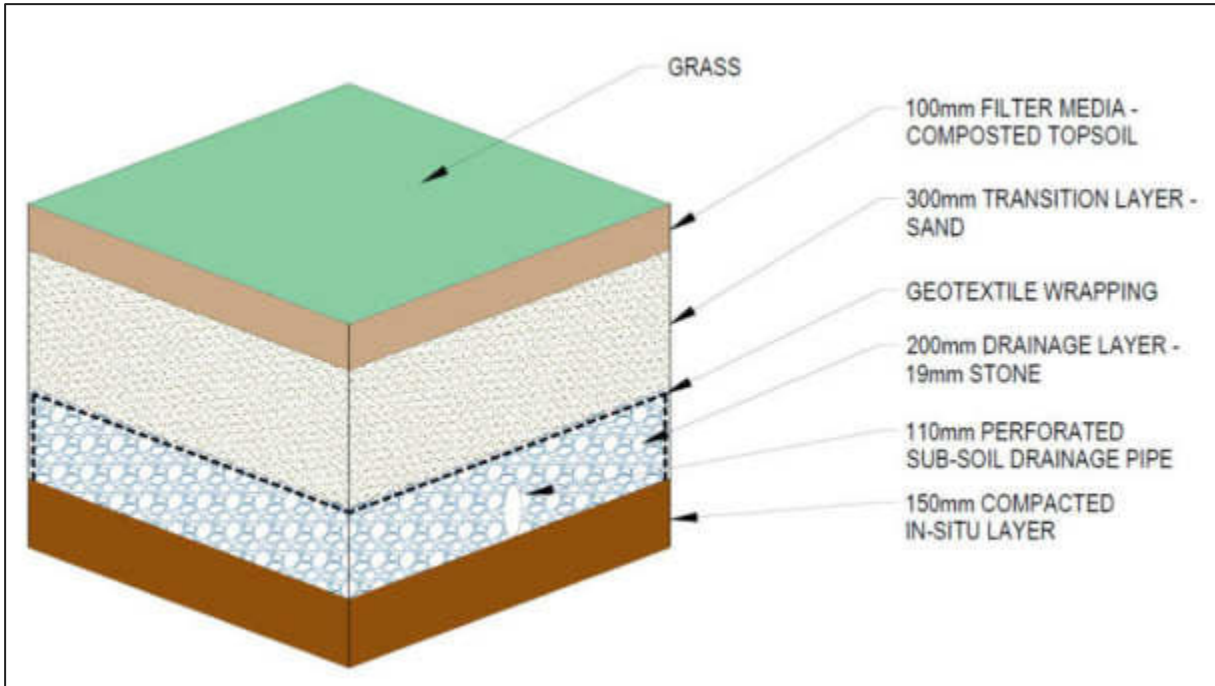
Typical Dry Attenuation Pond Engineered Layerworks
